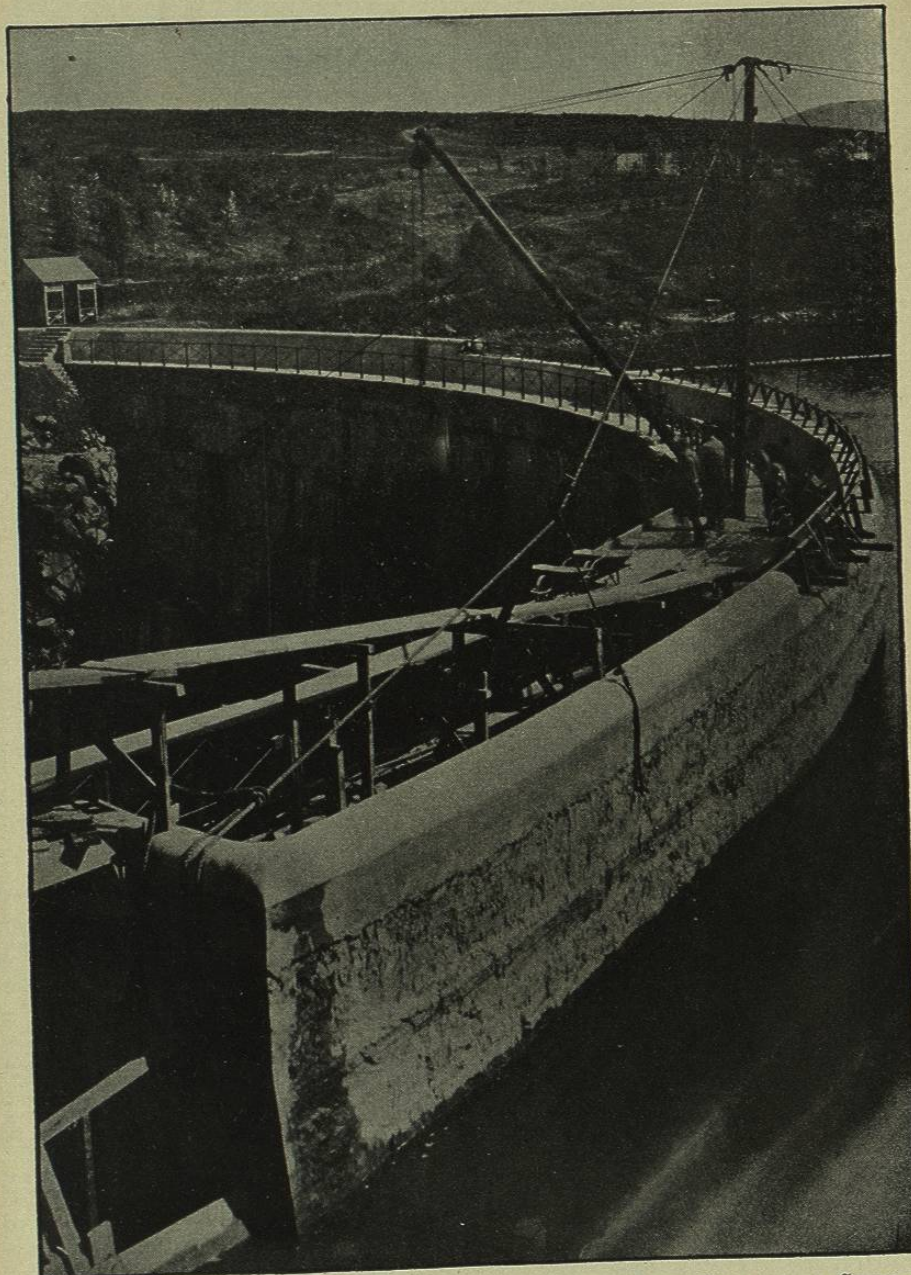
REPAIRING AND INCREASING THE HEIGHT OF THE PARAPET OF SWEETWATER DAM.
